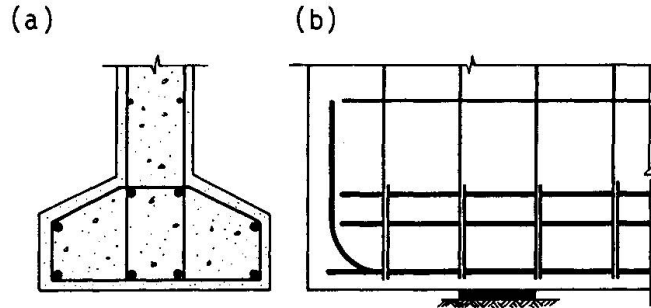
Detailing of bottom chord reinforcement: (a) Cross-section; (b) Elevation at support.
